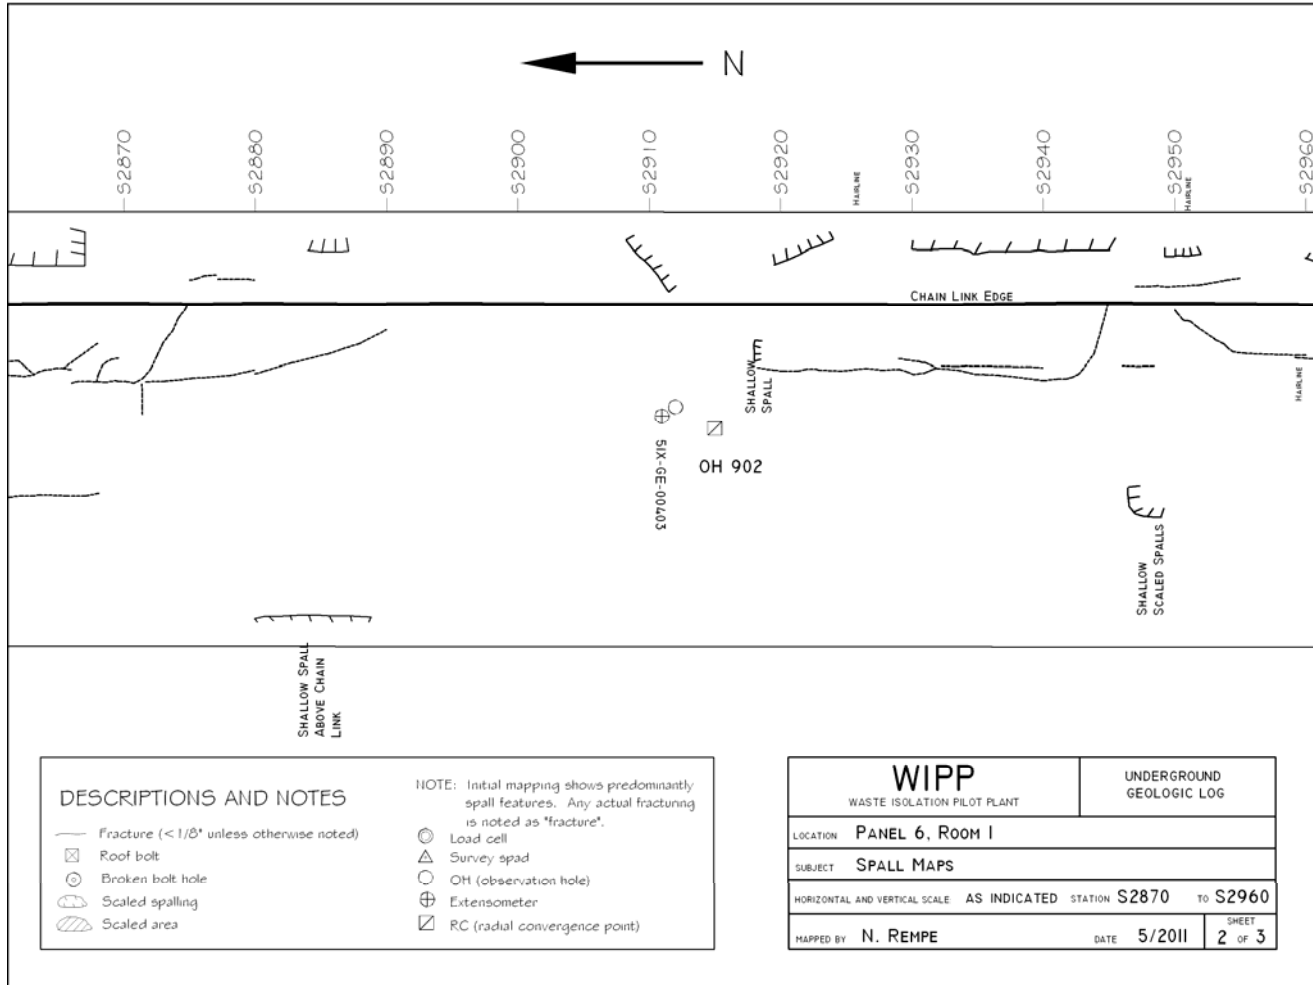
Panel 6 Room 1, S2770 S3060 Roof Fractures (Sheet 2 of 3)
